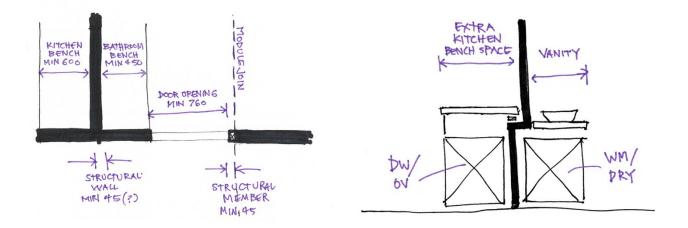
Sketches documenting minimum dimensions for a module that includes the kitchen and bathroom benches and the bathroom door (left) and minimisation of kitchen/bathroom utility width (right)
